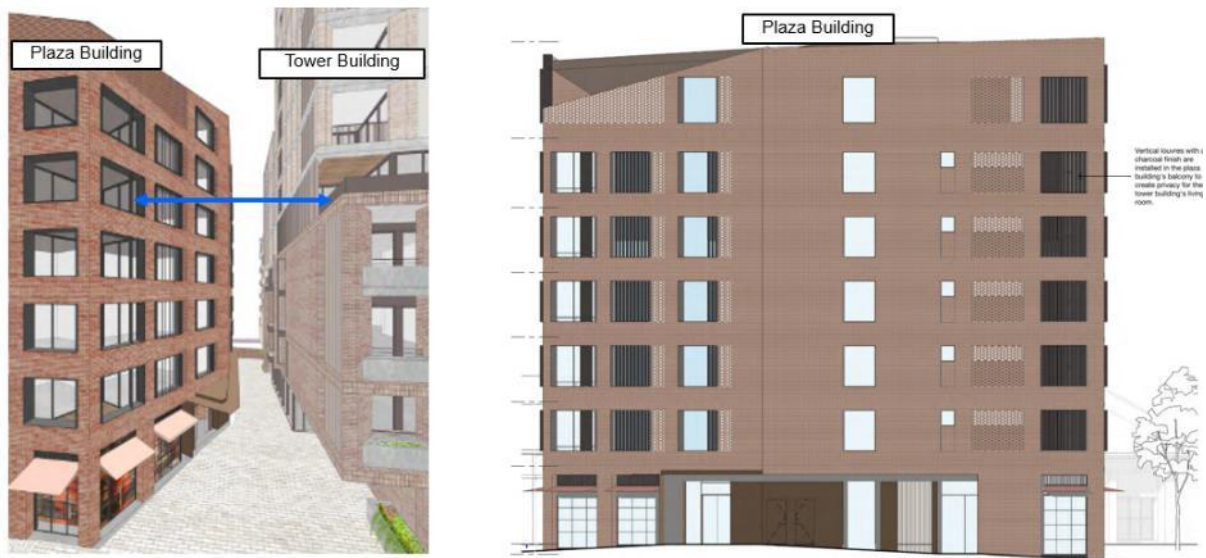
Mutual overlooking between balconies is mitigated between the Plaza Building (left) and Tower Building (right)
